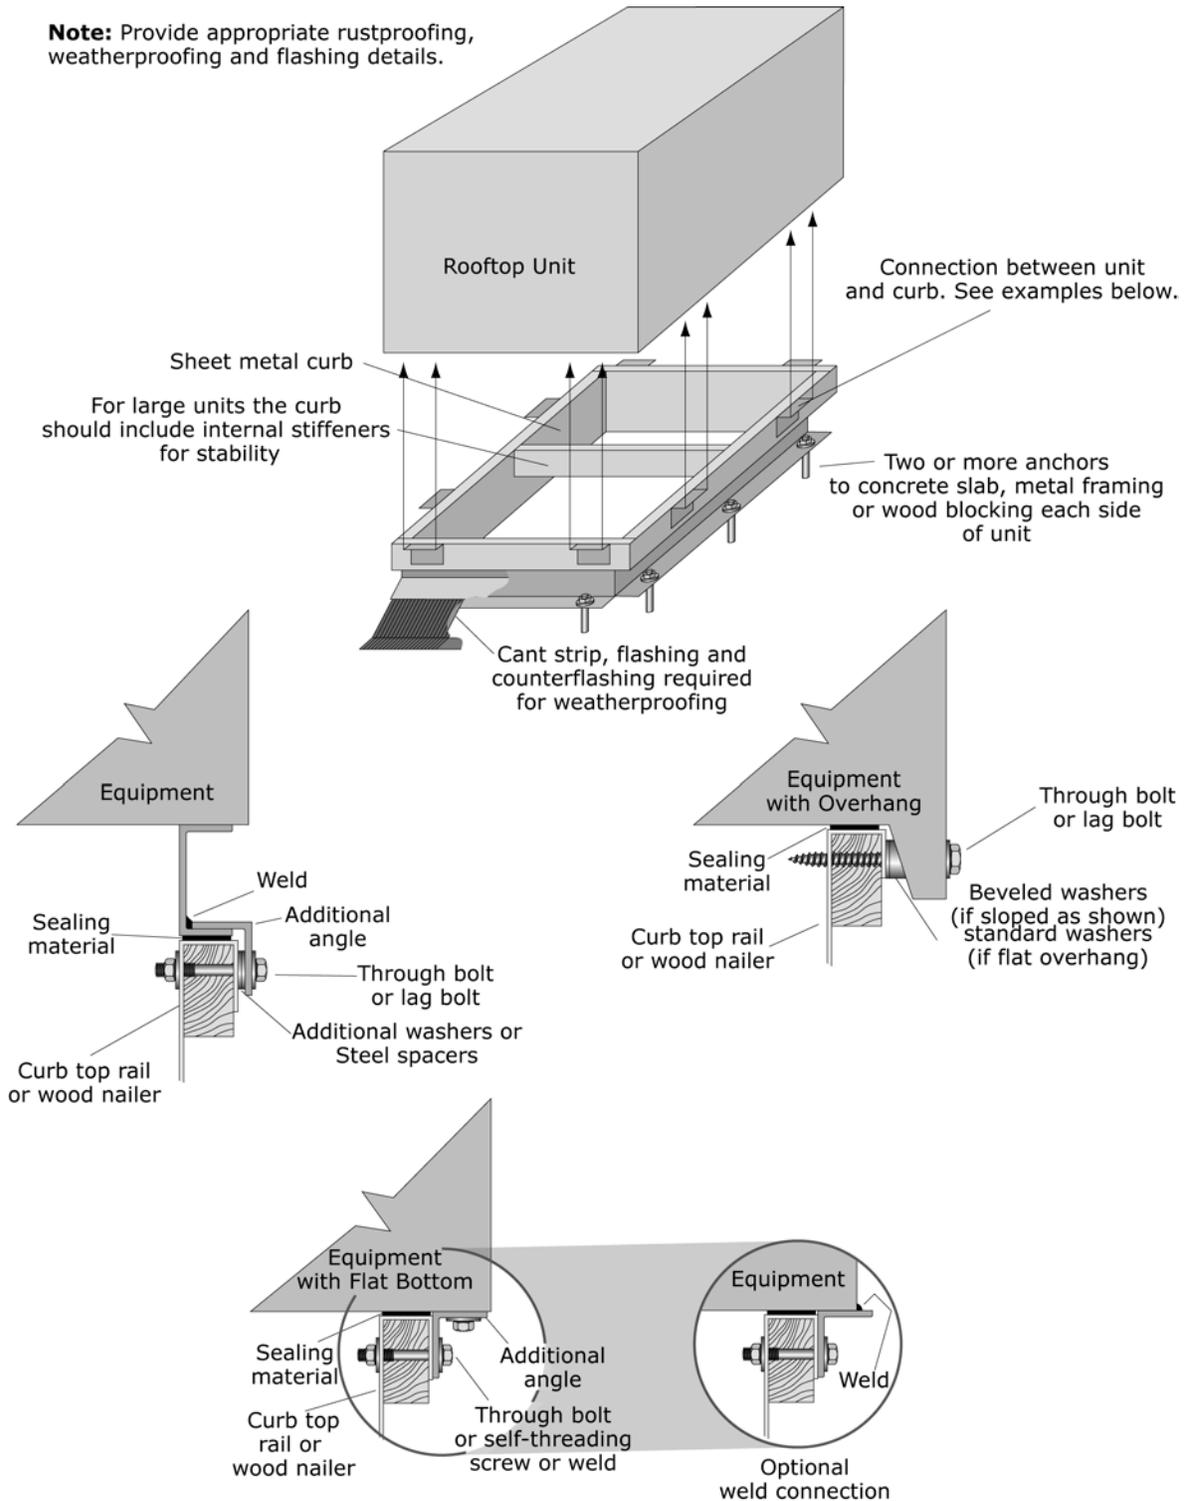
Rooftop HVAC equipment (ER).
